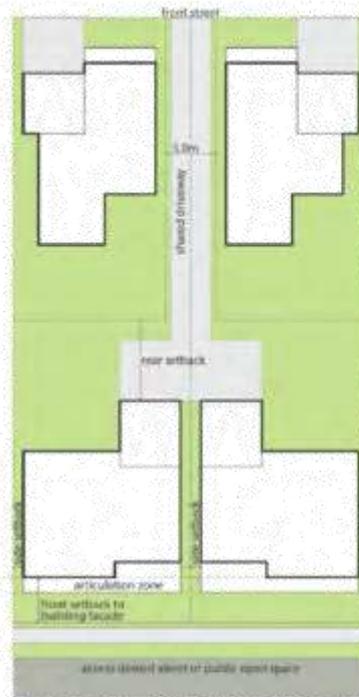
Battle axe lot (fronting access denied road) setbacks
